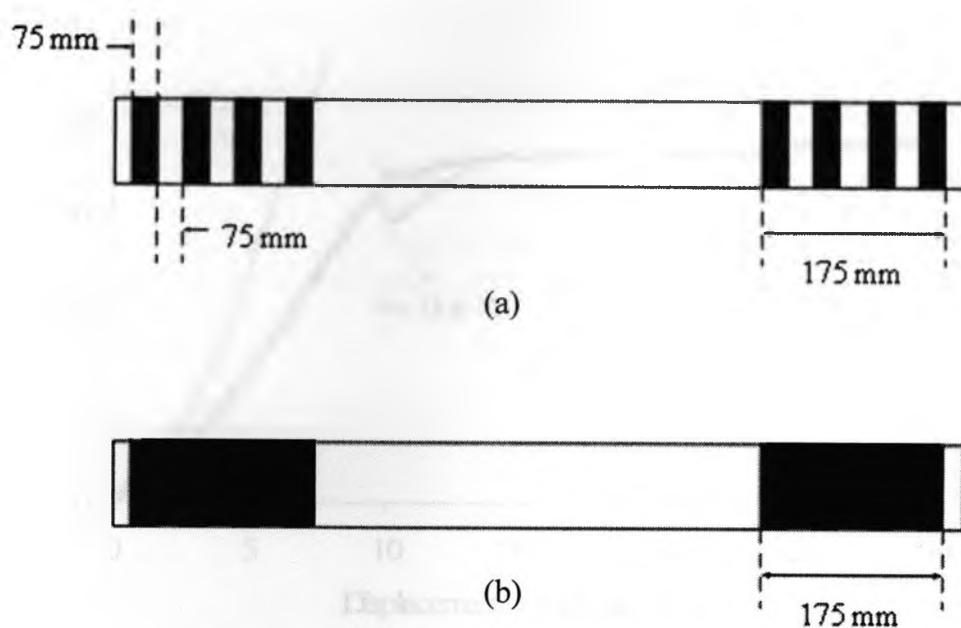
Typical shear strengthening details used in, (a) B-I-CR1, and (b) B-I-CR1 shear specimen.
